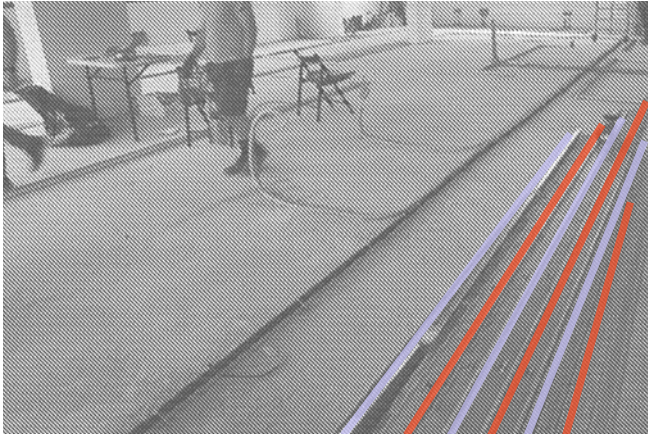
Preparing for resource-saving drywall construction requires a little more lead time.
